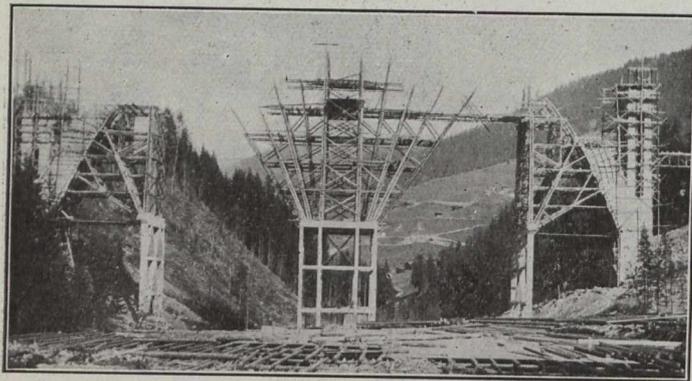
View of Falsework Under Construction, Showing Side Falsework Bents.
